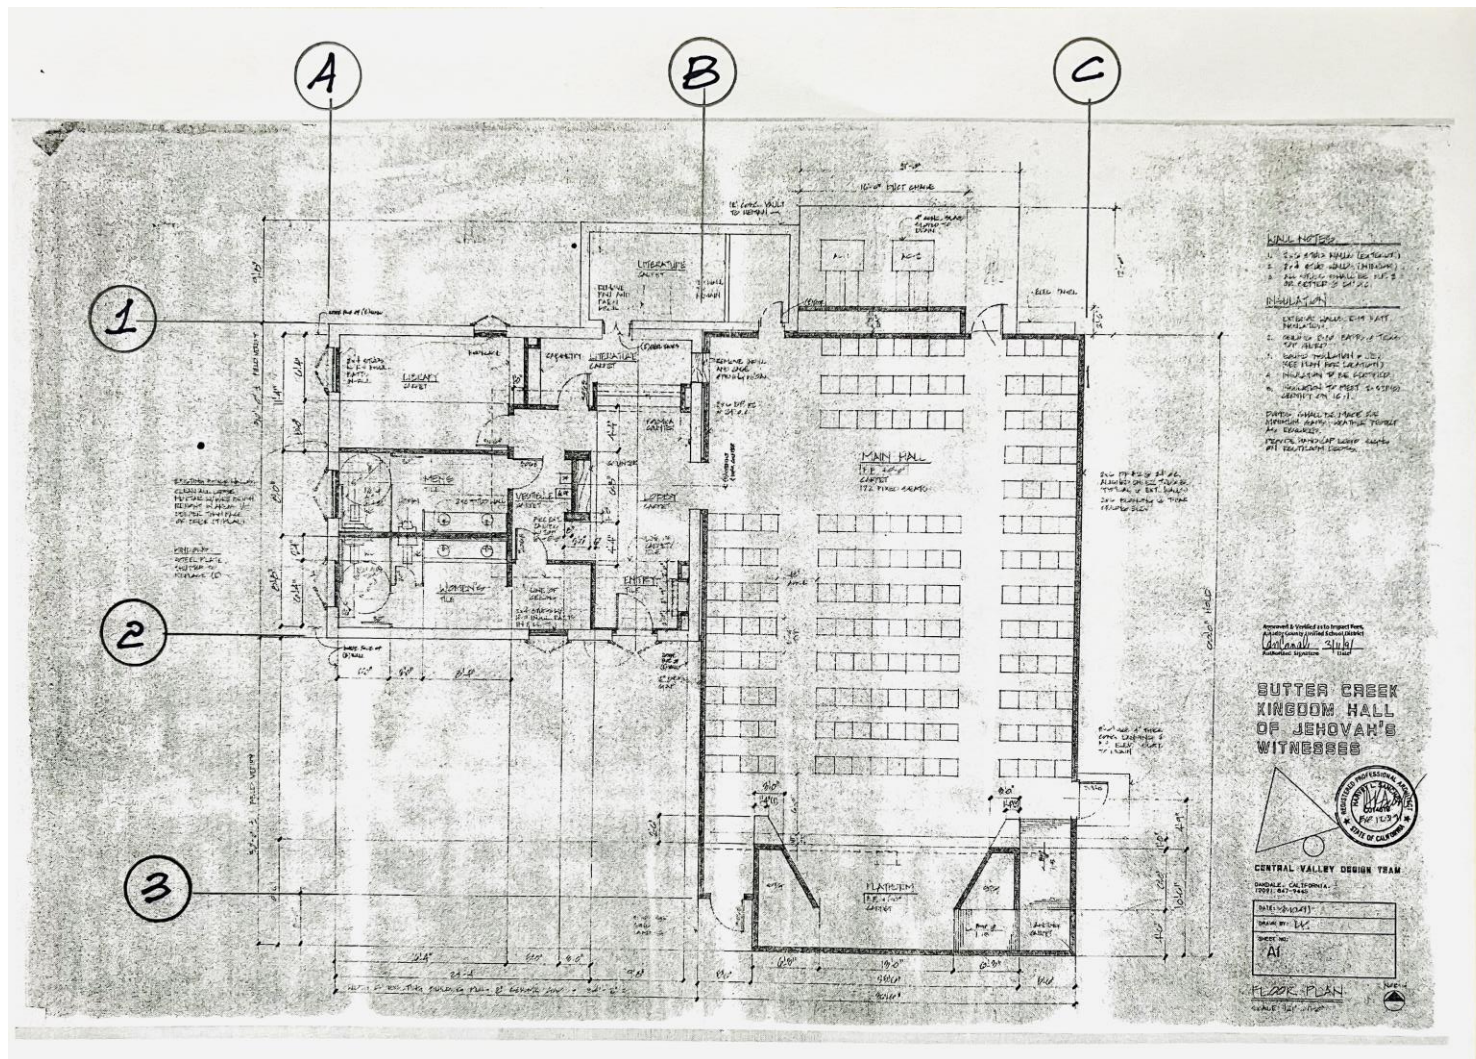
1991 Floor Plan: URM Building between Gridlines "A" and "B"
